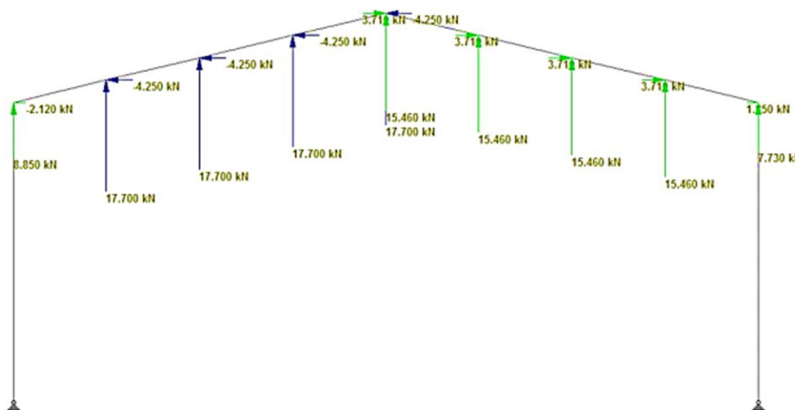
Wind loads acting at the purlin positions of pre-engineered steel frame for wind angle 0°
